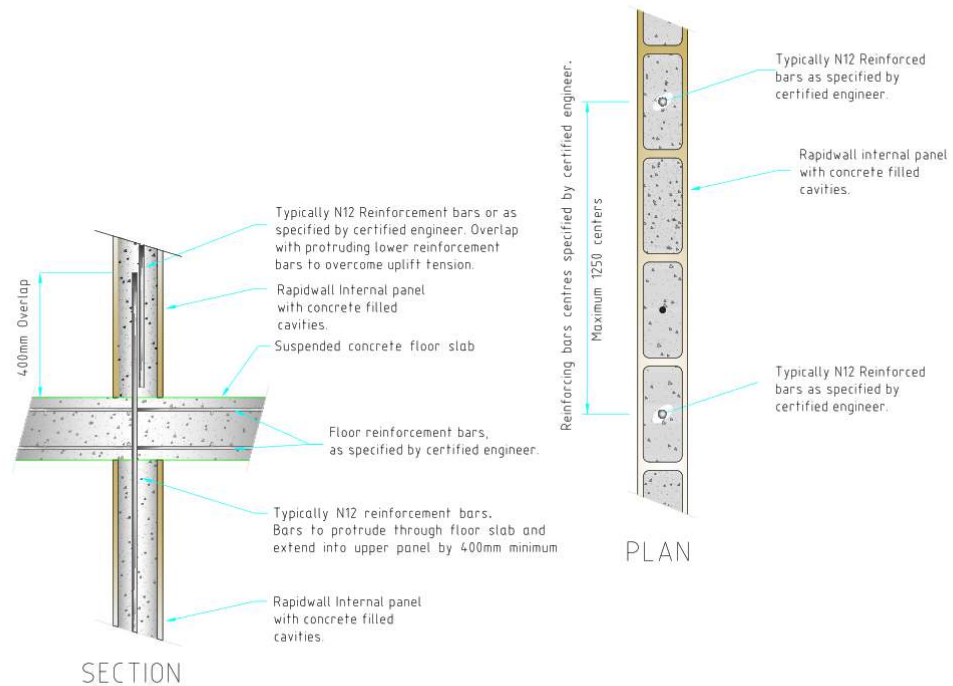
Concrete filled Rapidwall Internal wall to suspended floor continuously reinforced
